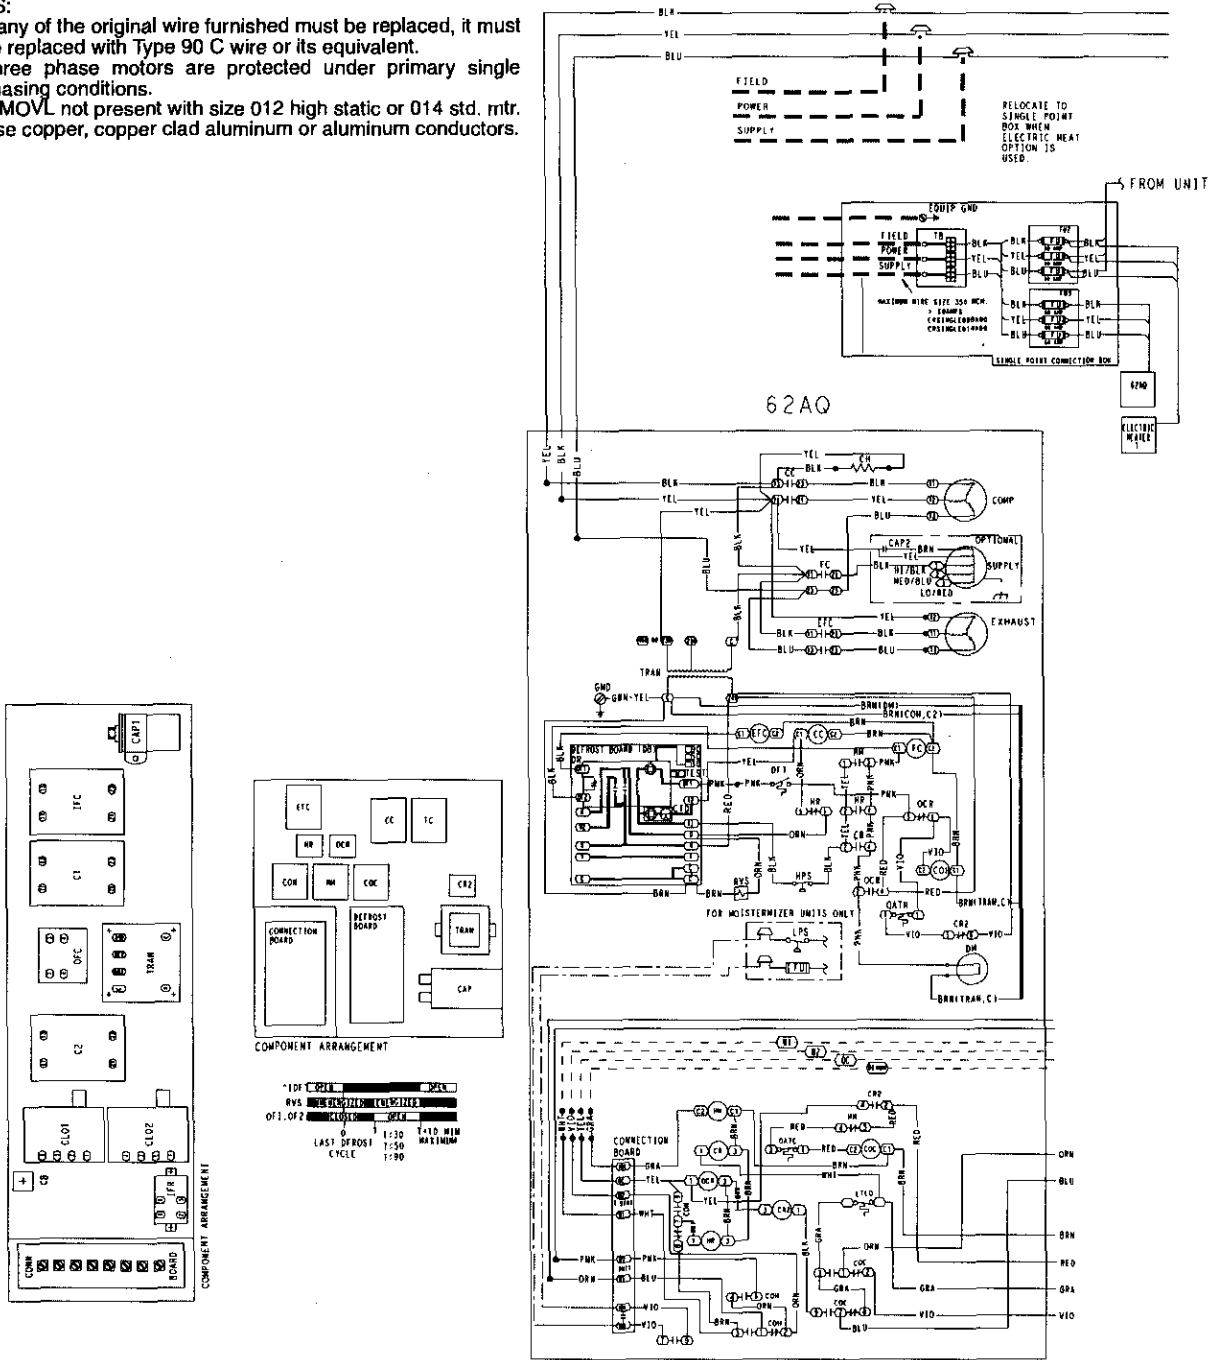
COBRA™ Unit Wiring Schematic (50HJ014 with 62AQ300, 460-3-60) with Electro-Mechanical Controls
